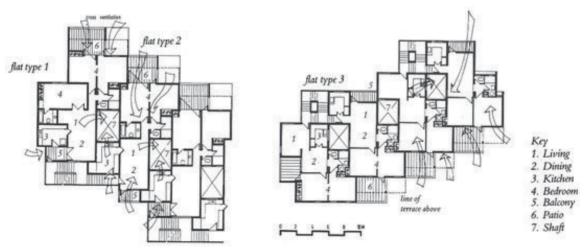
Typical floor plans of three unit types showing the air flow and cross-ventilation.
